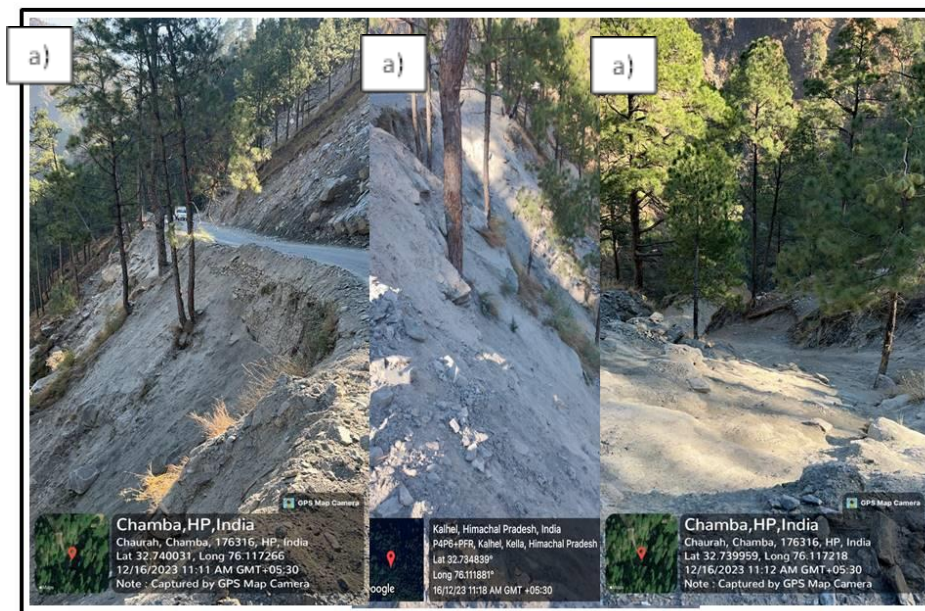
Image depicts a) leeward side of the road where hard rock dipping towards hillock can be seen which can be used to raise the protection and road widening wall b) slope angle and the pulverized material located at MDR 85 site c) the slope angle at the lower part of the slide zone
